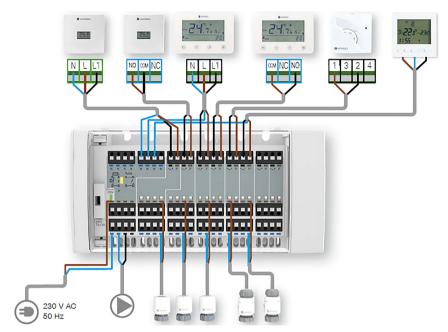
Controller terminal bar with room thermostats, pump and thermostatic actuators
